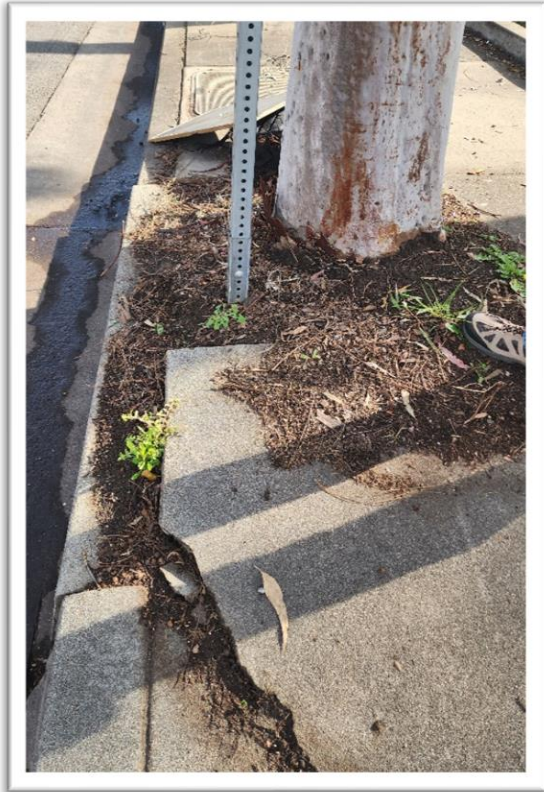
This is a view of a damaged sidewalk from root crown expansion (#484).
